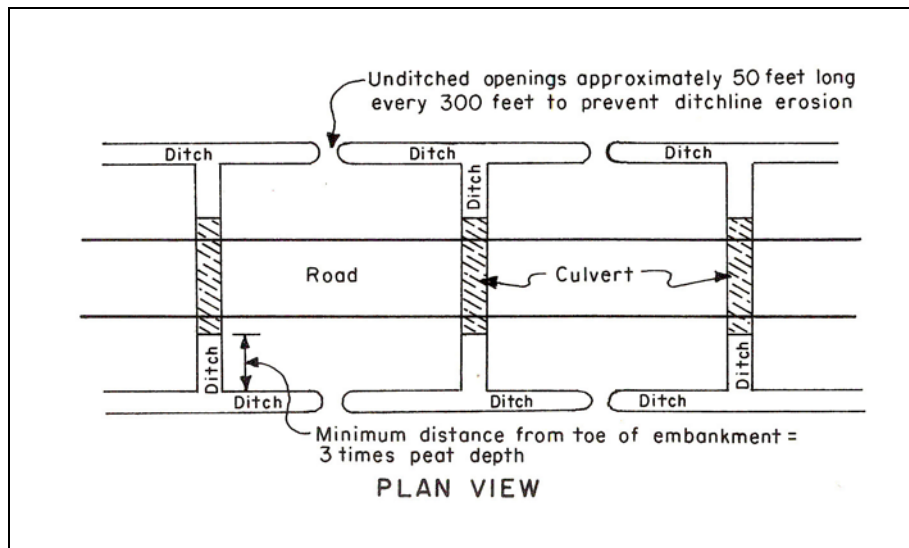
Illustration of Use and Placement of Culverts and Ditches for Wetland Roads.
